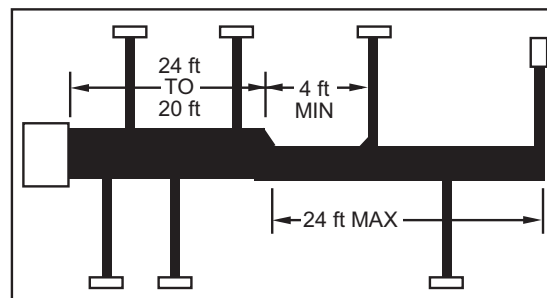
(b): Trunk and Branch System (Reducing extended plenum system)
